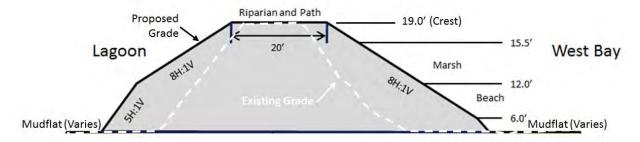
Typical cross-section of proposed berm for model grid (not to scale).
